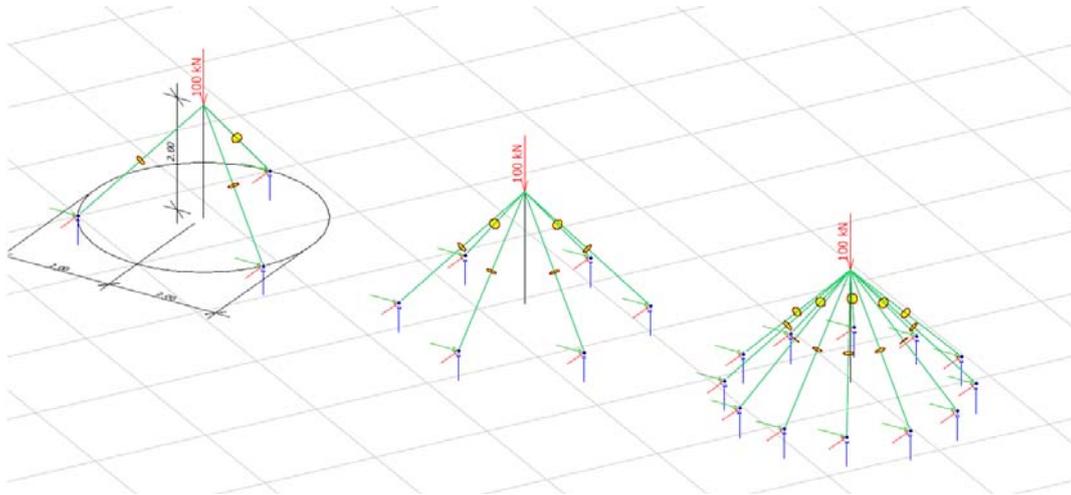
Alternative truss layouts in the case of a vertical point load at the top
